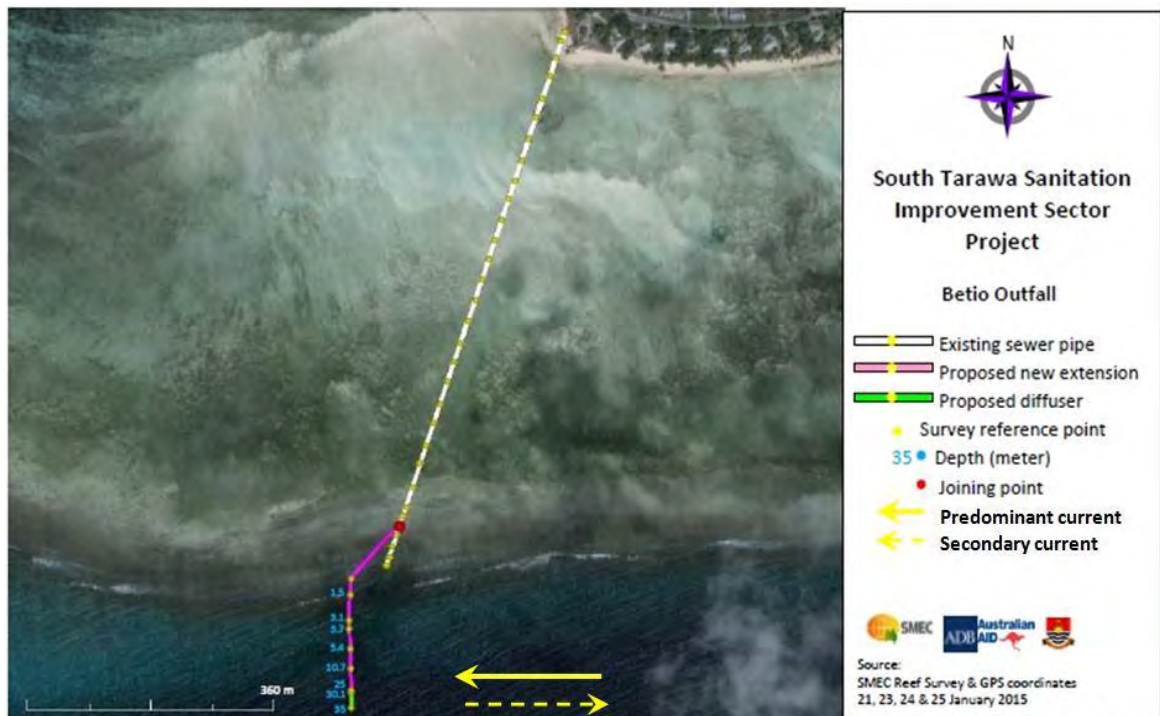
Existing Outfall Pipe and Proposed Extension at Betio
